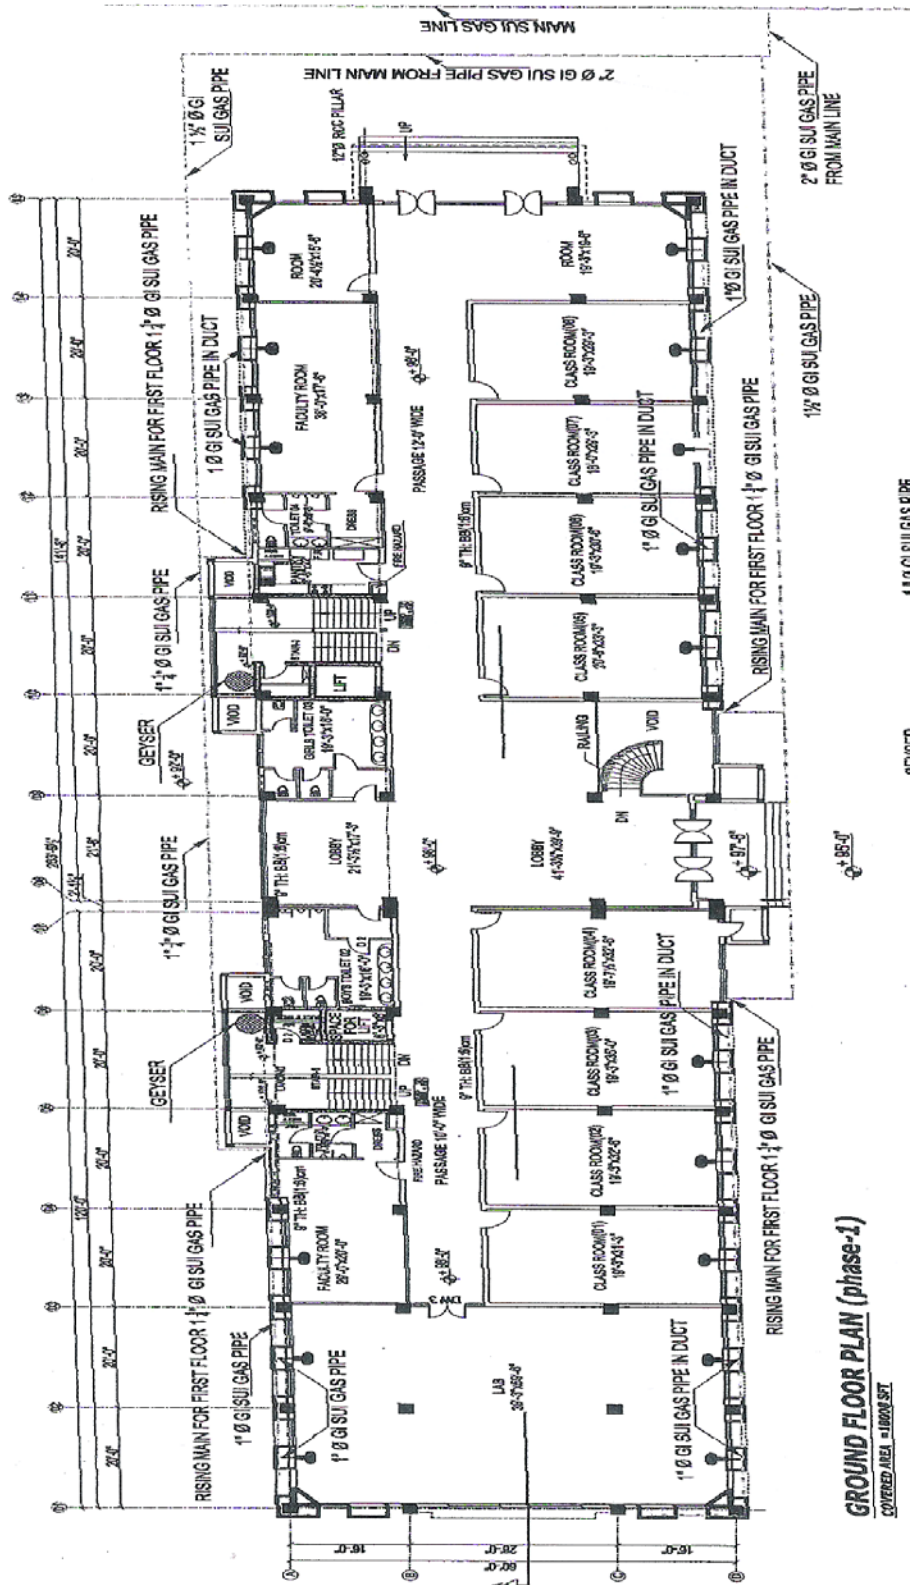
Site Map: Central Campus, Ground Floor Bahria University
